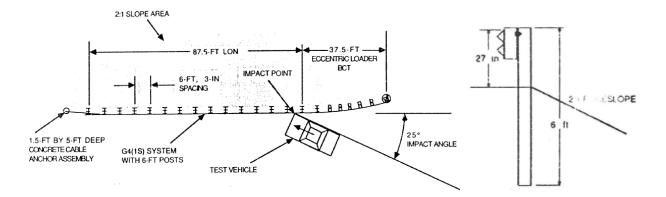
G4(1S) Installation Adjacent to 1V:2H Slope with 6-ft Long Steel Posts for Test No. 1717-4-88 [8]
